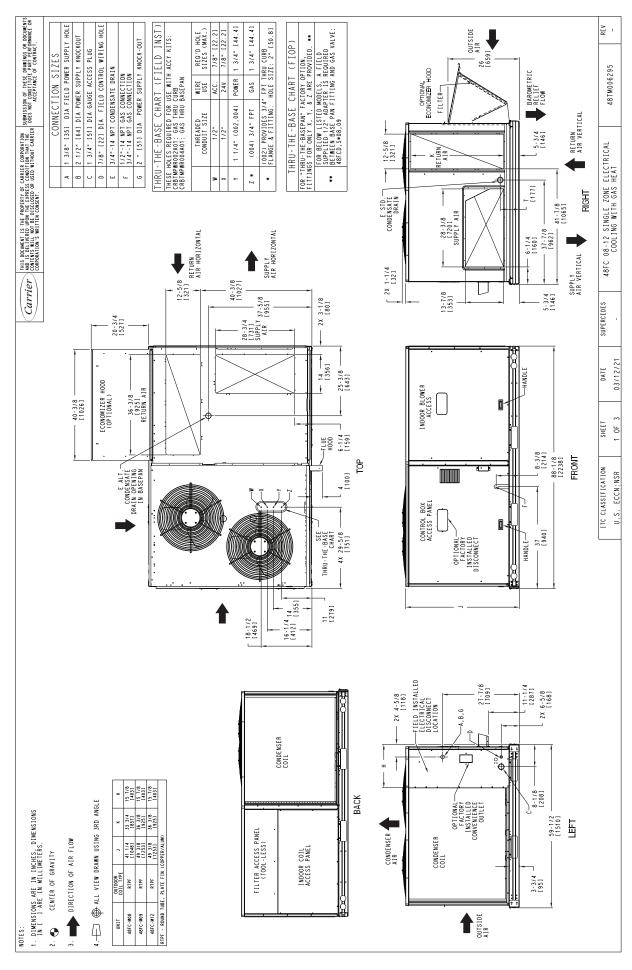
Unit Dimensional Drawing – Sizes 08, 09, 12
